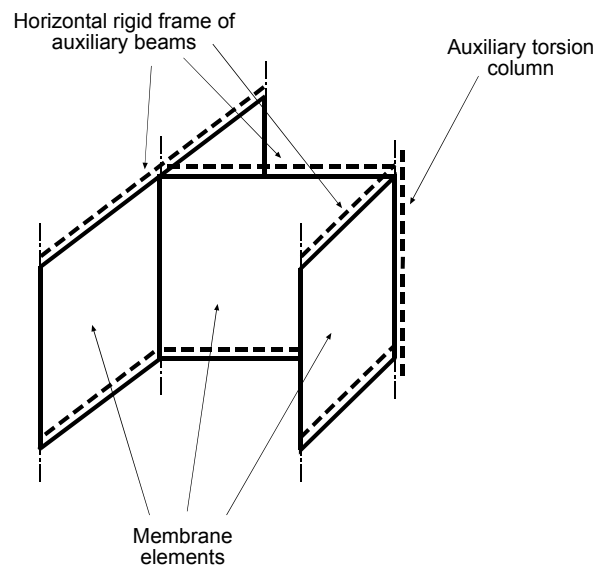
Membrane Elements with Rigid Beams at Floor Levels and Auxiliary Torsion Column
